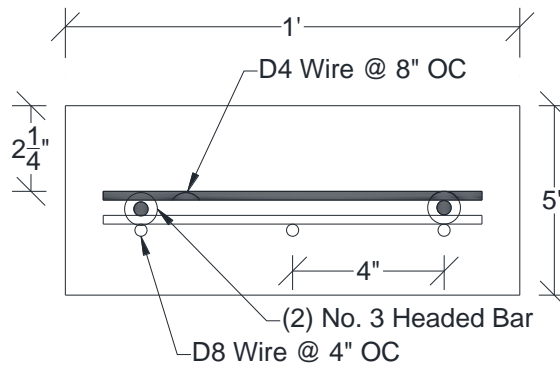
Detailing for Beam Test Specimen with 3-in. Splice Lengths Utilizing No. 3 Headed Bars
